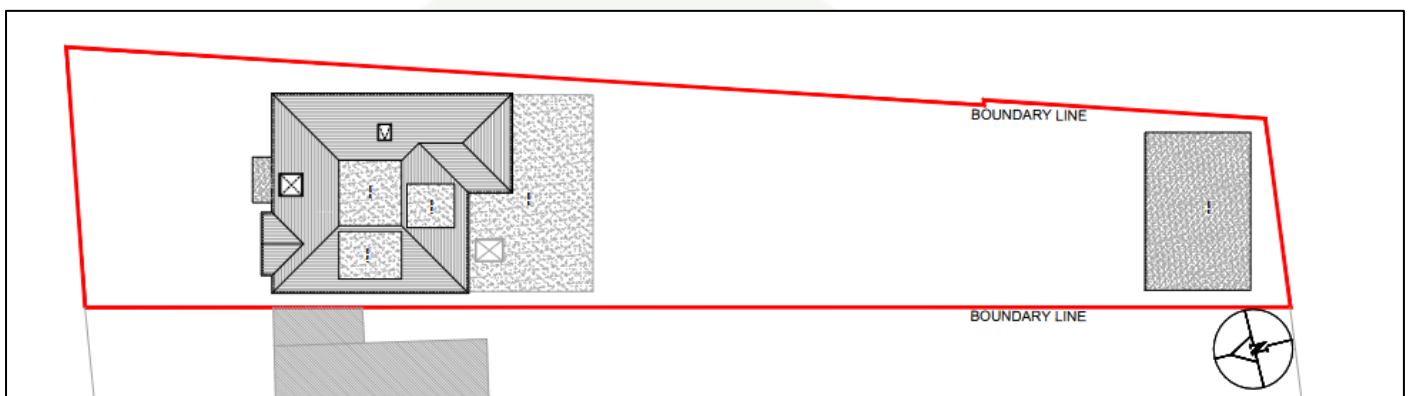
Proposed Development Site Plan - DE Architectural Consult. Ltd
